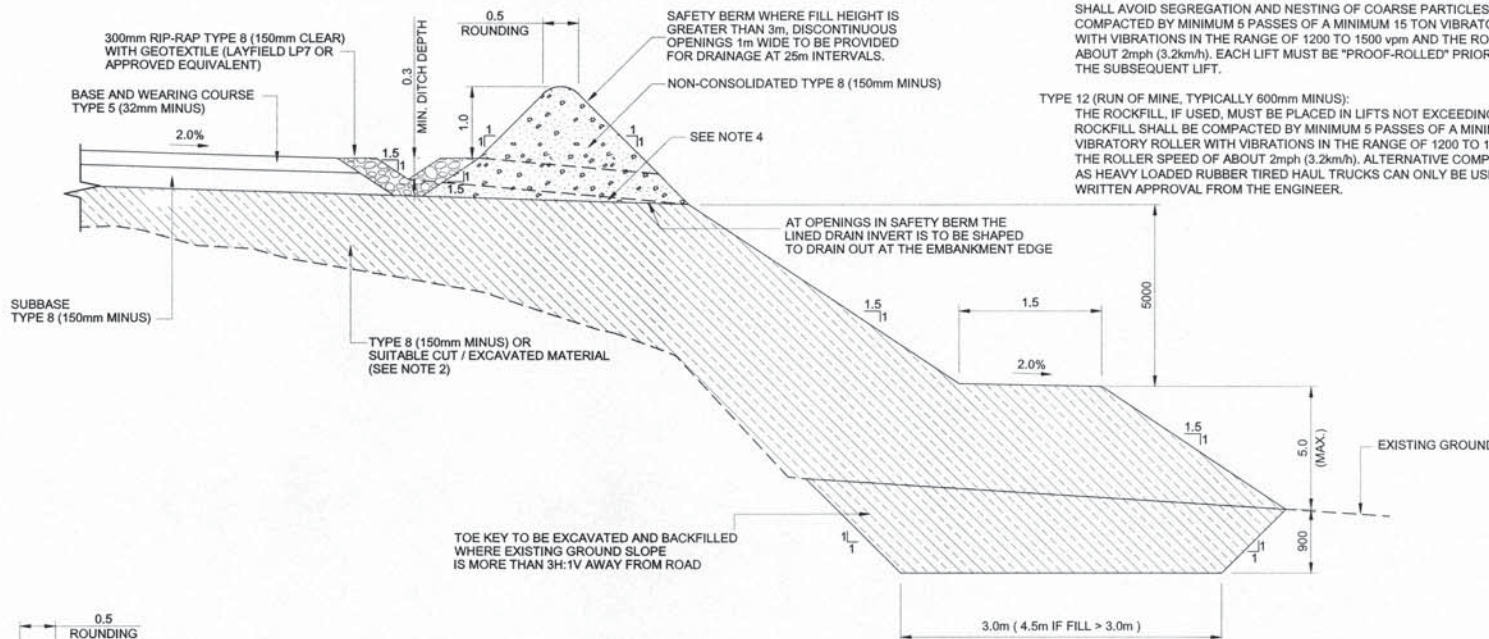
INTERNAL ROAD - TYPICAL SIDE DITCH - FILL
